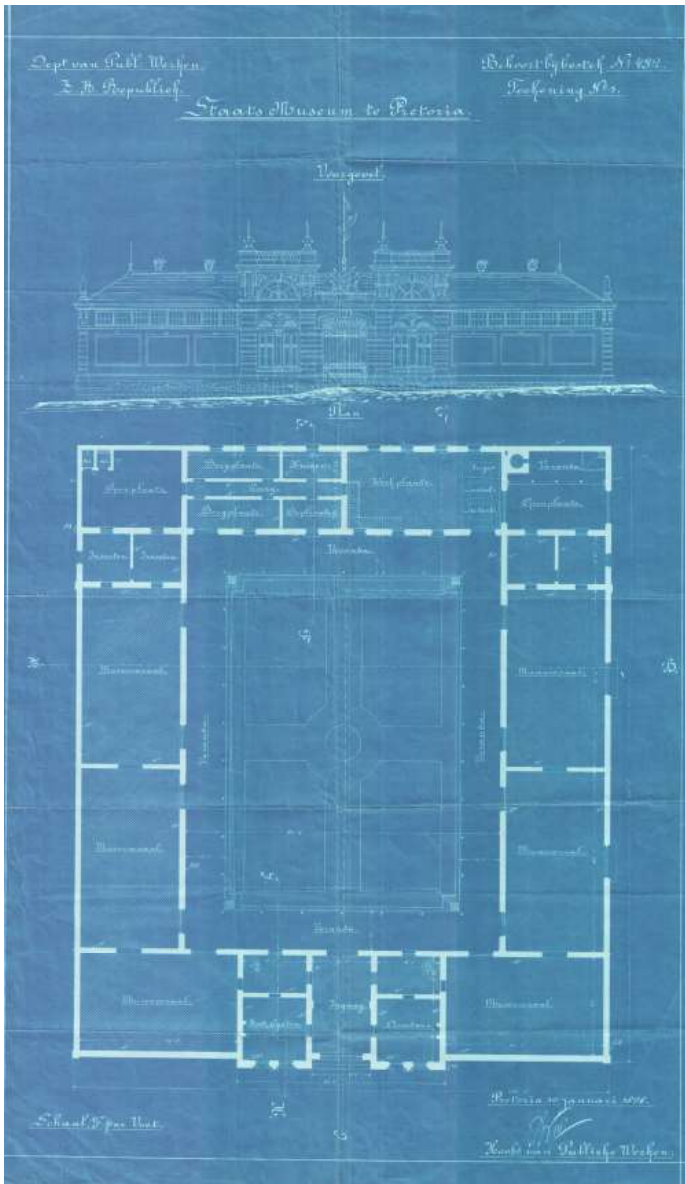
Original Elevation and Plan of the Staatsmuseum 1899
